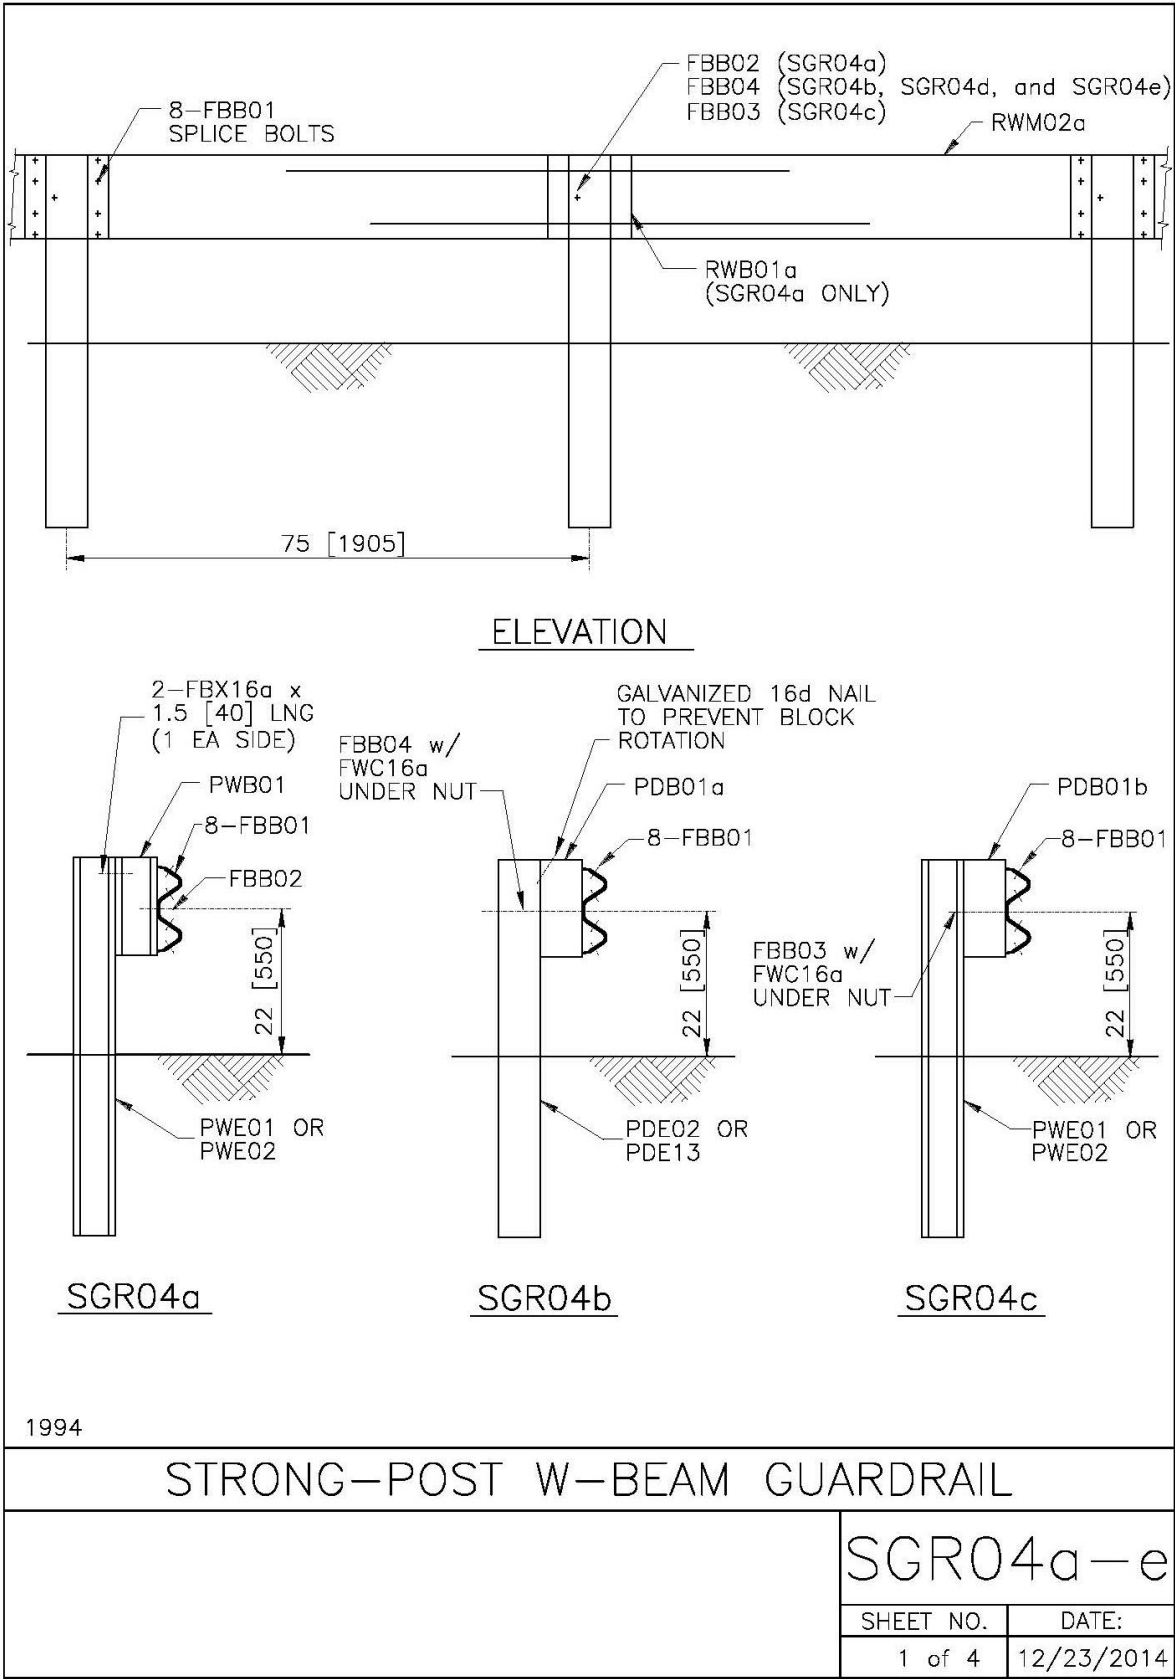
G4(2W) Guardrail System for Use with Round Posts, Sheet 1
